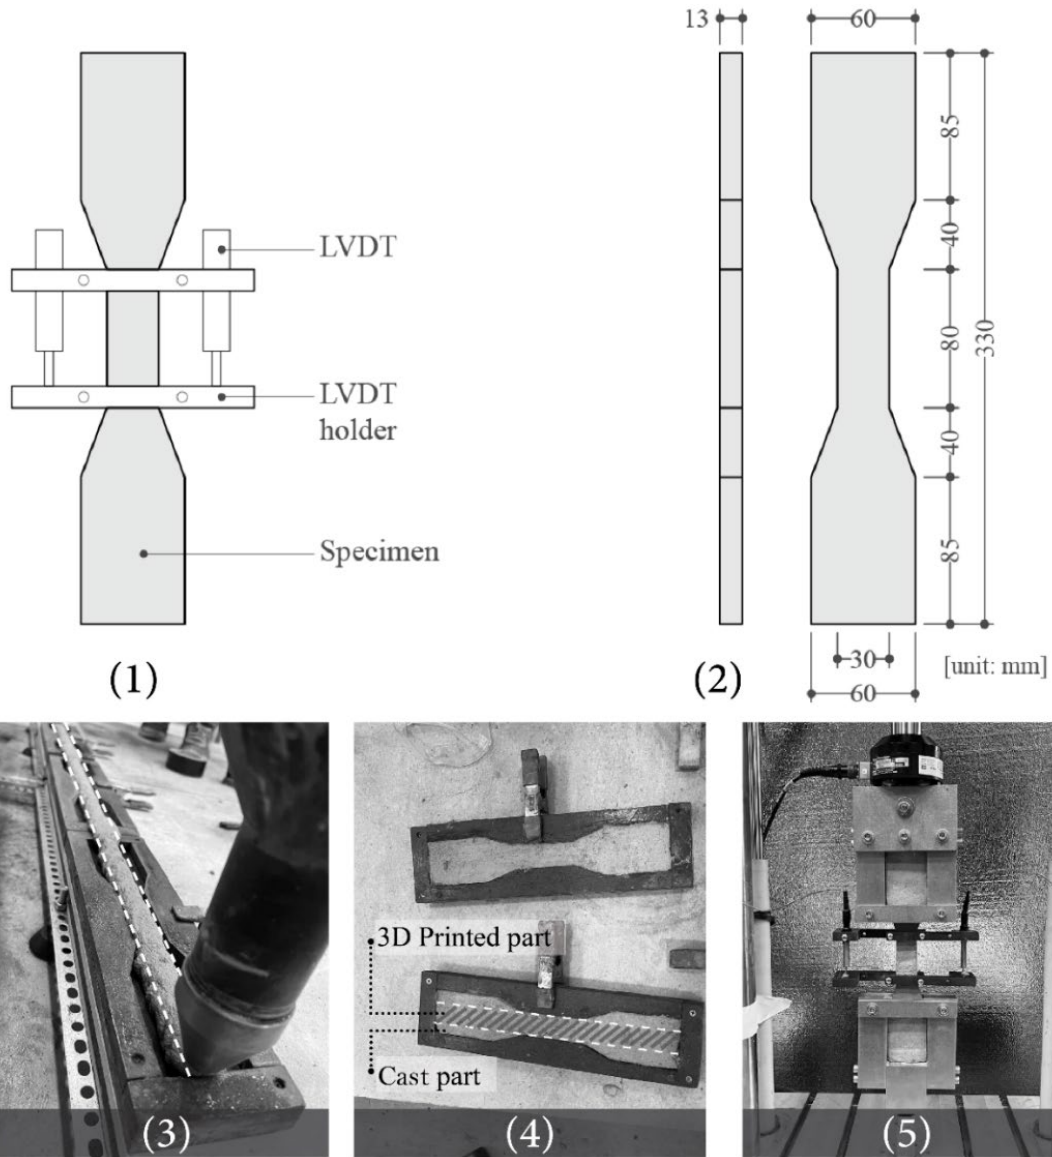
Uniaxial direct tensile test schematic test setup (1), dimension of dog-bone 3D printed samples (2), 3D printing the specimen inside the molds for under tension area (3), specimen showing 3D printed and cast part (4), test setup (5)
